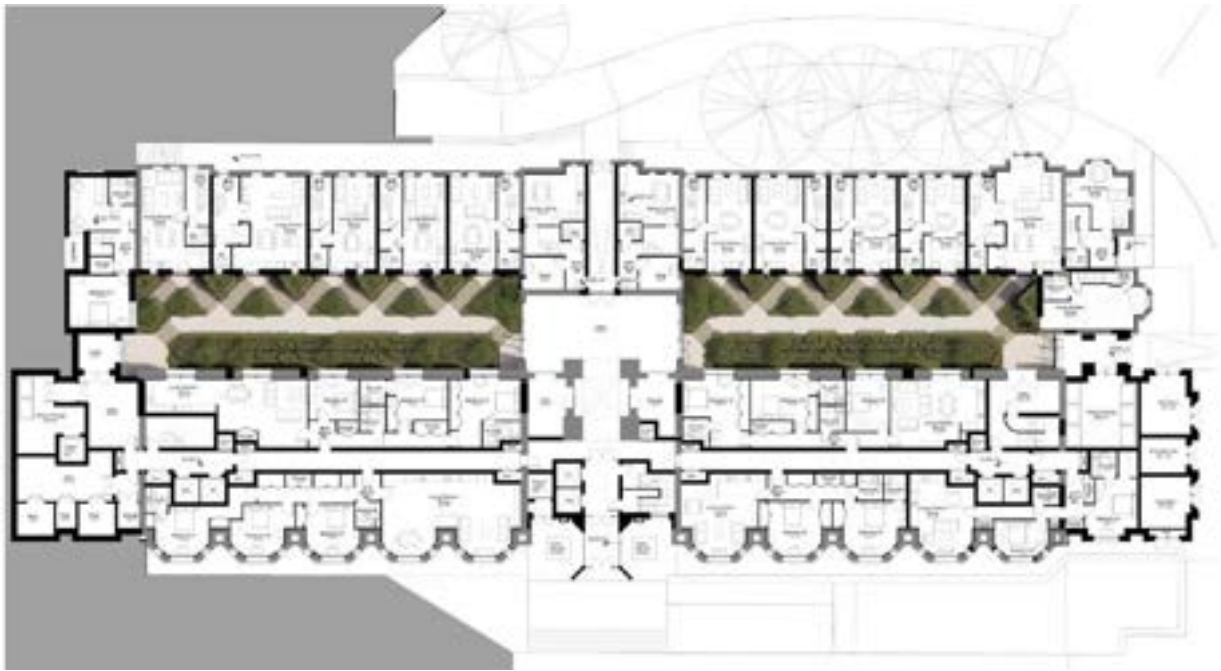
Main Range and Admin Block: Proposed ground floor layout
